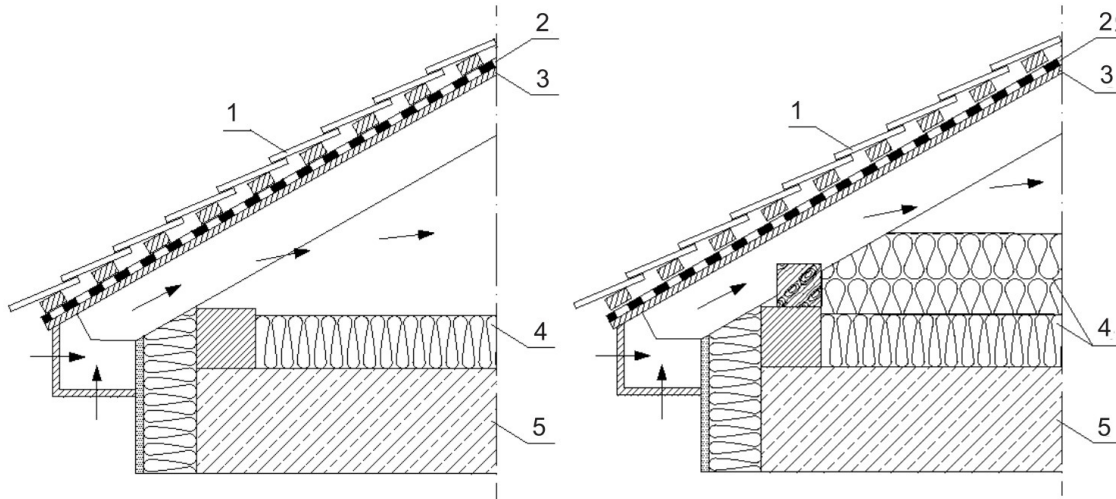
Retrofitting a roof above an unused attic: 1 – roofing (tiles), 2 – water- and wind-proofing, 3 – soffit, 4 – thermal insulation, 5 – ceiling
